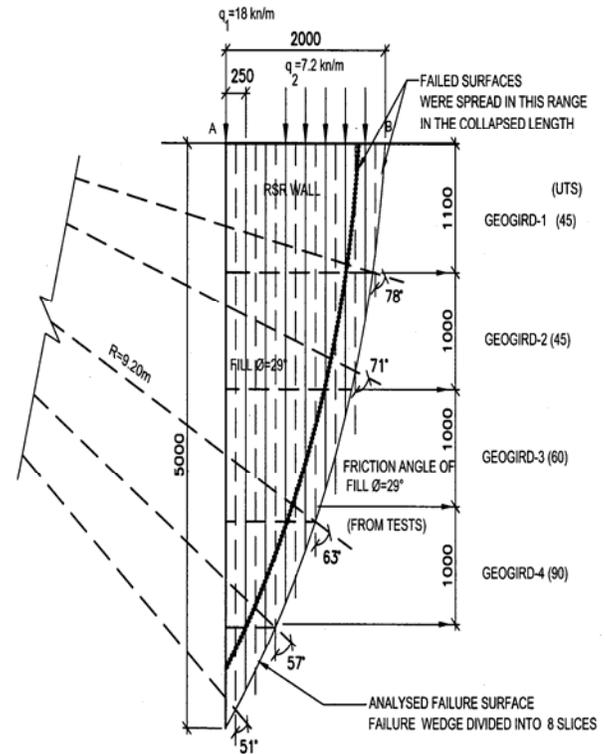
Section of RSR Wall showing Critical Surface Analysed
